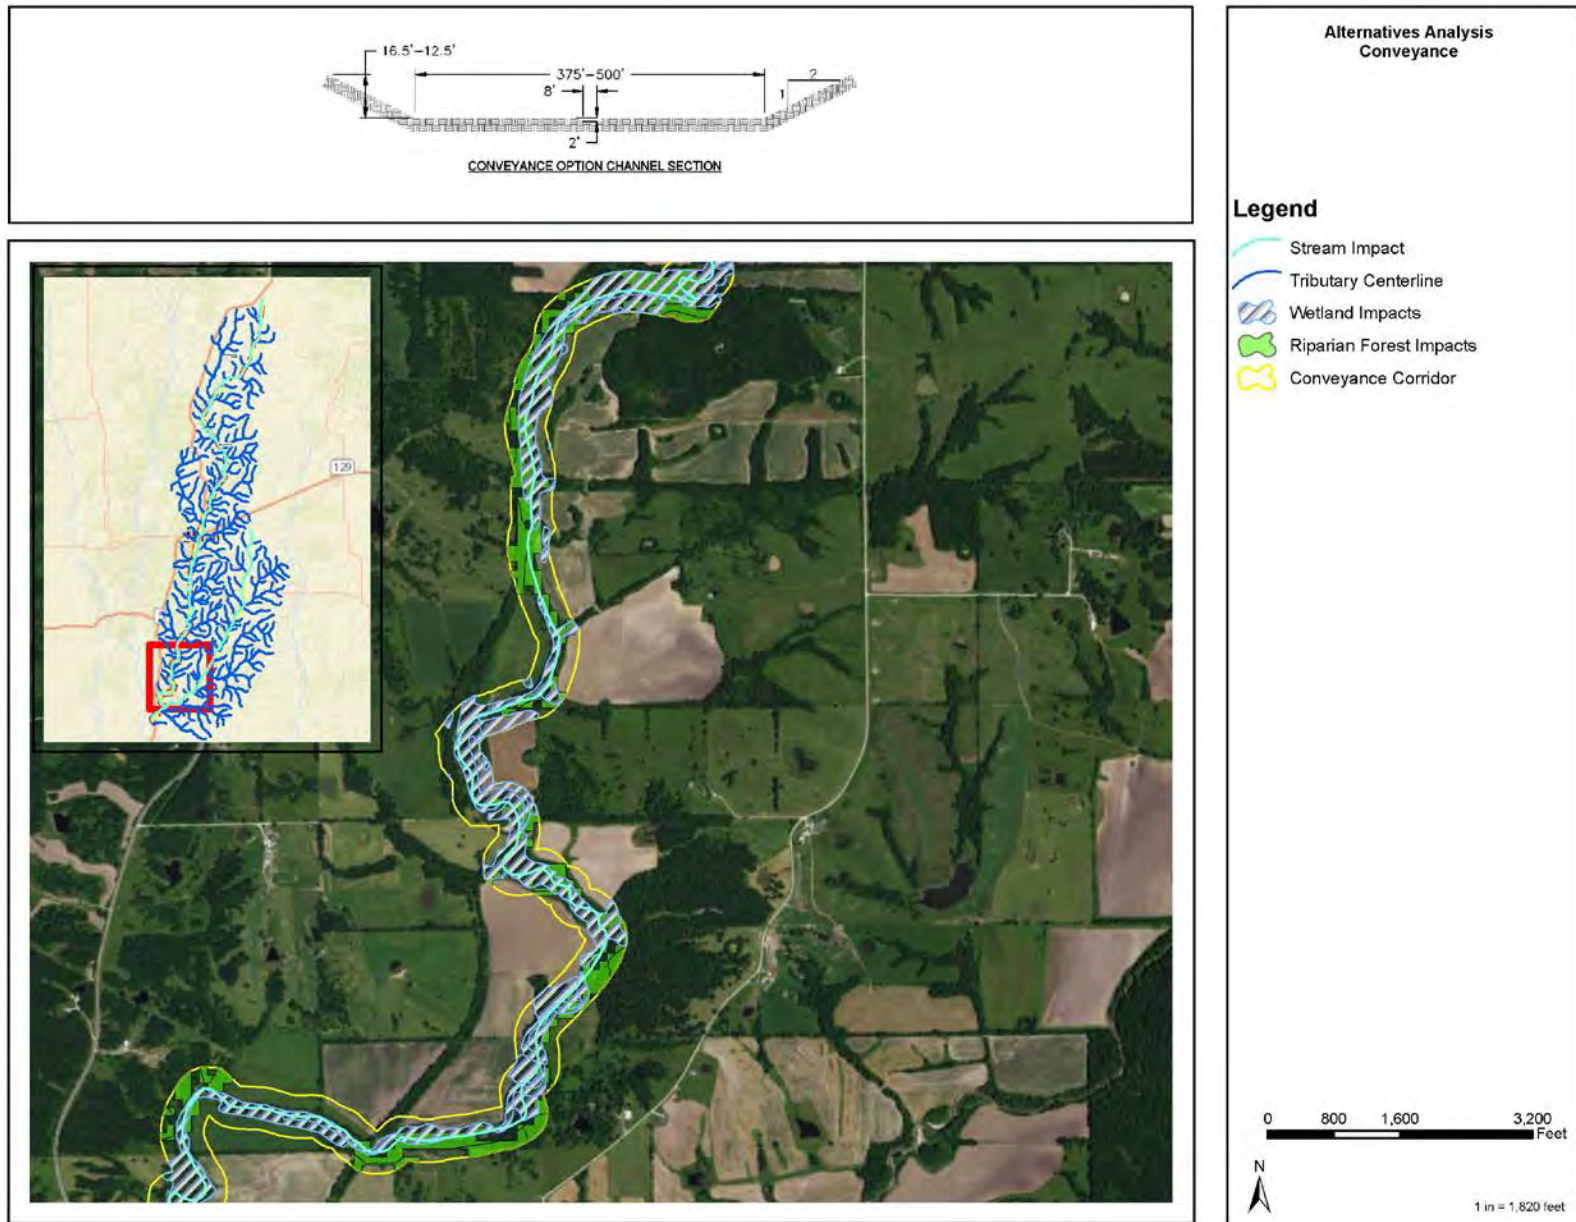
Stream Conveyance Conceptual Plan.
